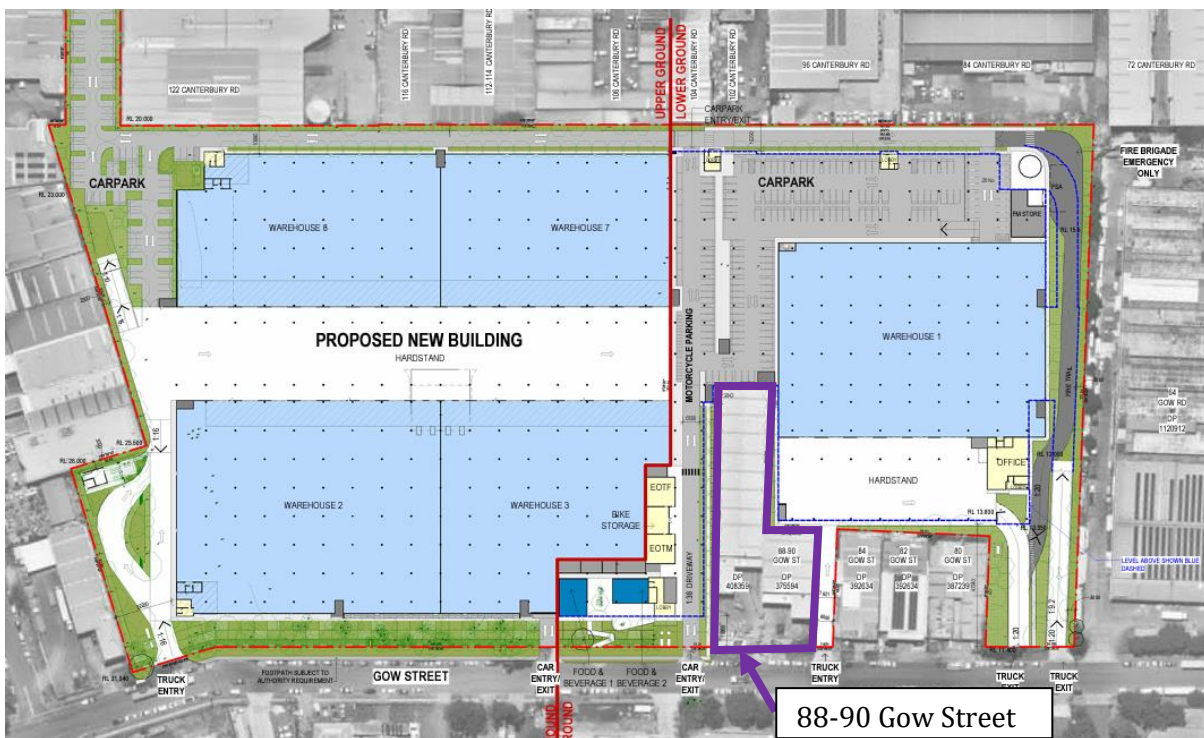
Proposed Site Plan (Source: Nettletontribe, Drawing No. PML-NT-AR-DA006 Issue P8)
